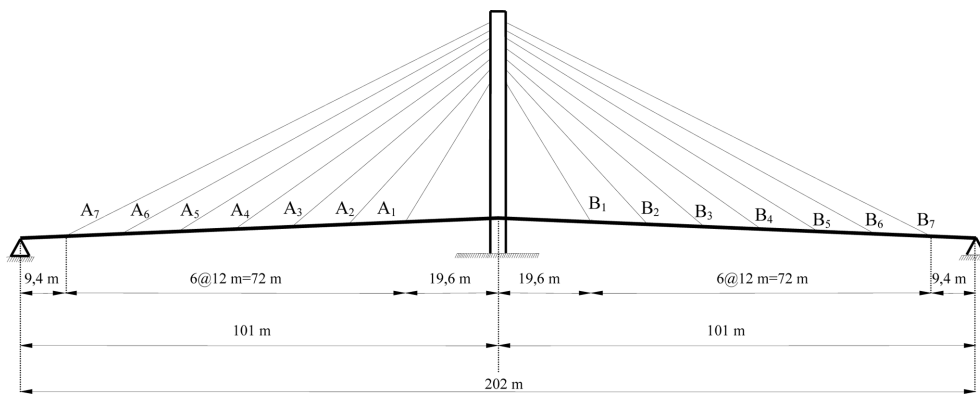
The schematic form of Manavgat Cable-Stayed Bridge
